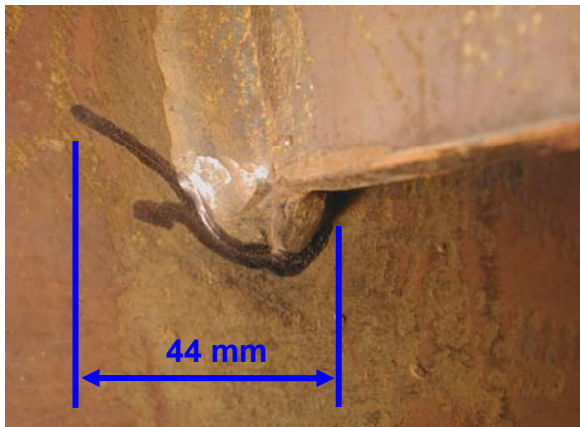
Specimen 1: Fatigue Crack at D3-R2-East
